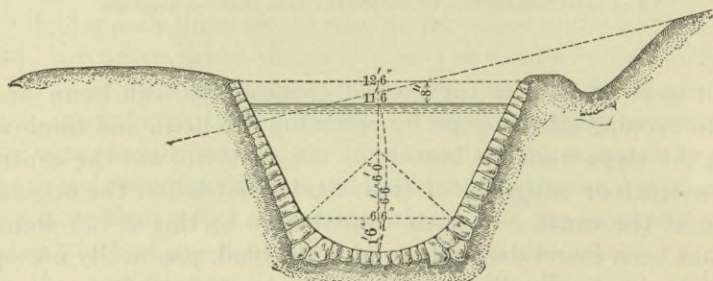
CROSS-SECTION OF LINED CHANNEL, SANTA ANA CANAL.
